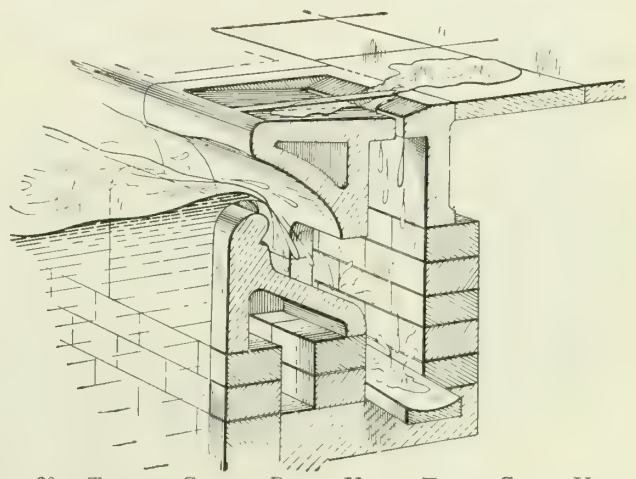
TRENCH GUTTER BUILT UP OF TERRA COTTA UNITS AND BRICK—FOR 24 IN. WALL SECTION
